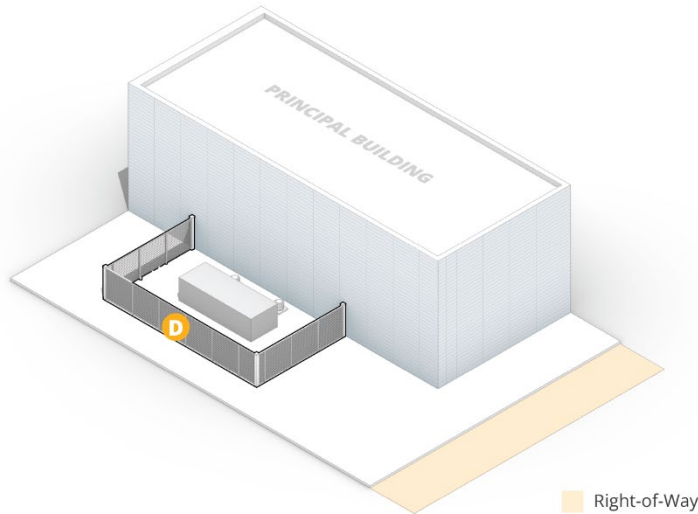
Ground or Wall Mounted Building - Mechanical Equipment
